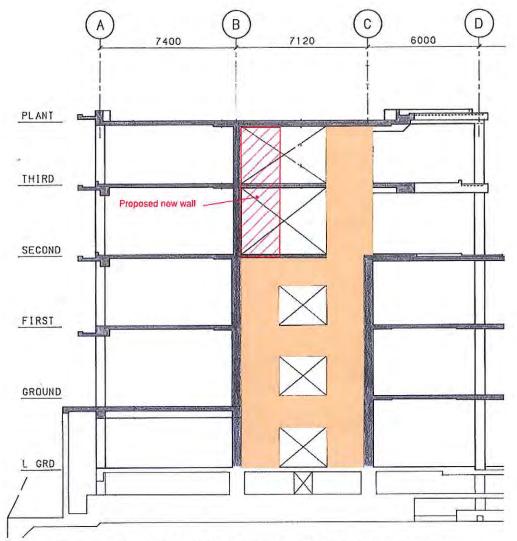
Typical Shear Wall Layout with Proposed New Wall.
